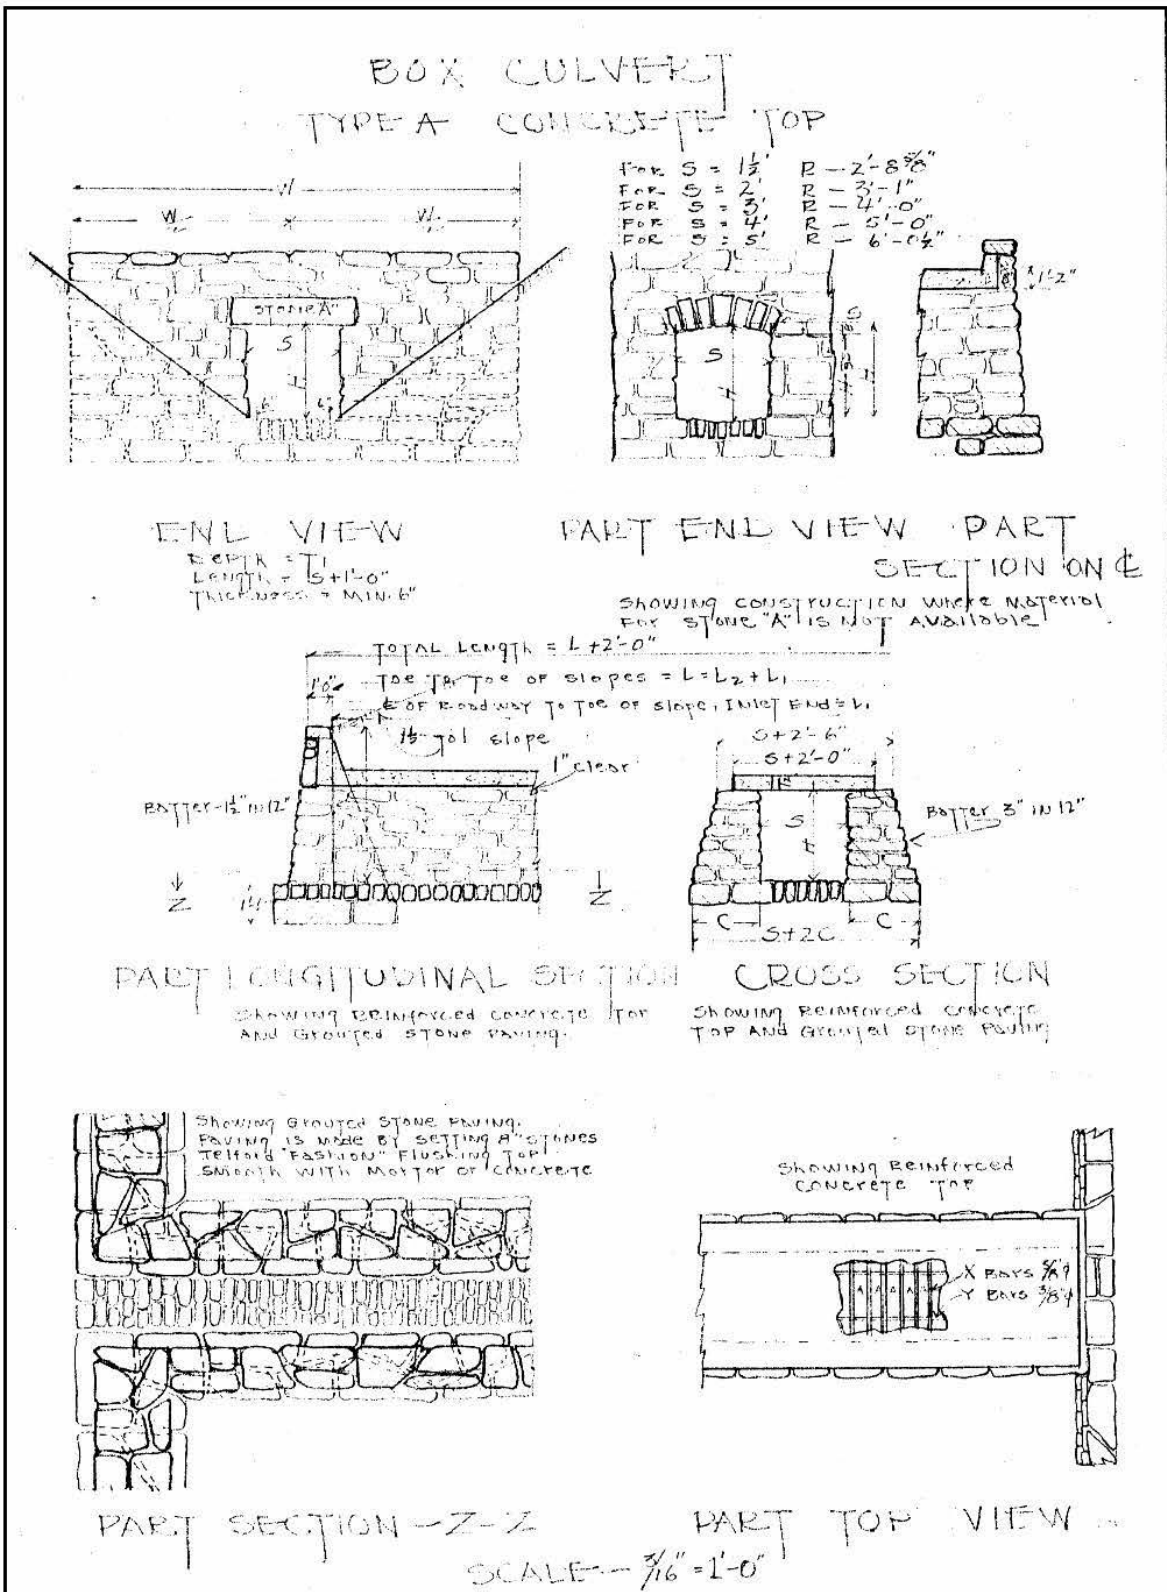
"Box Culvert," (General Construction Notes, 1935).
